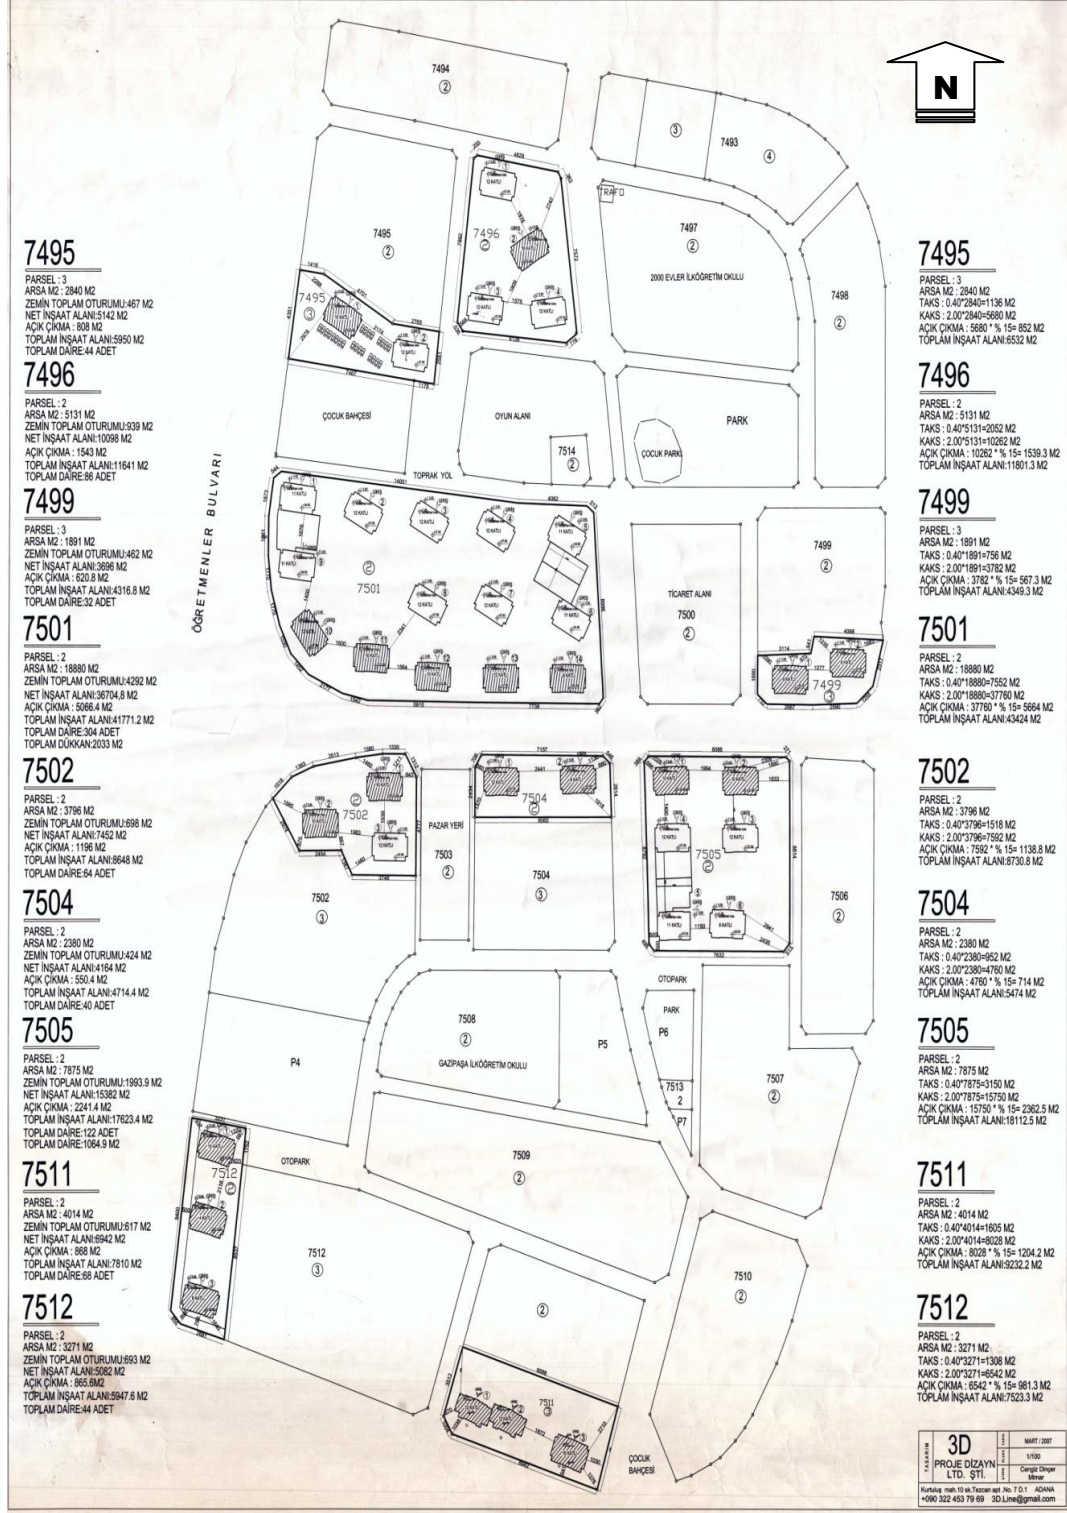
19: ADANA-KOOP Site Plan scale: 1/1000, 2007 (Adana Koop Archive)
